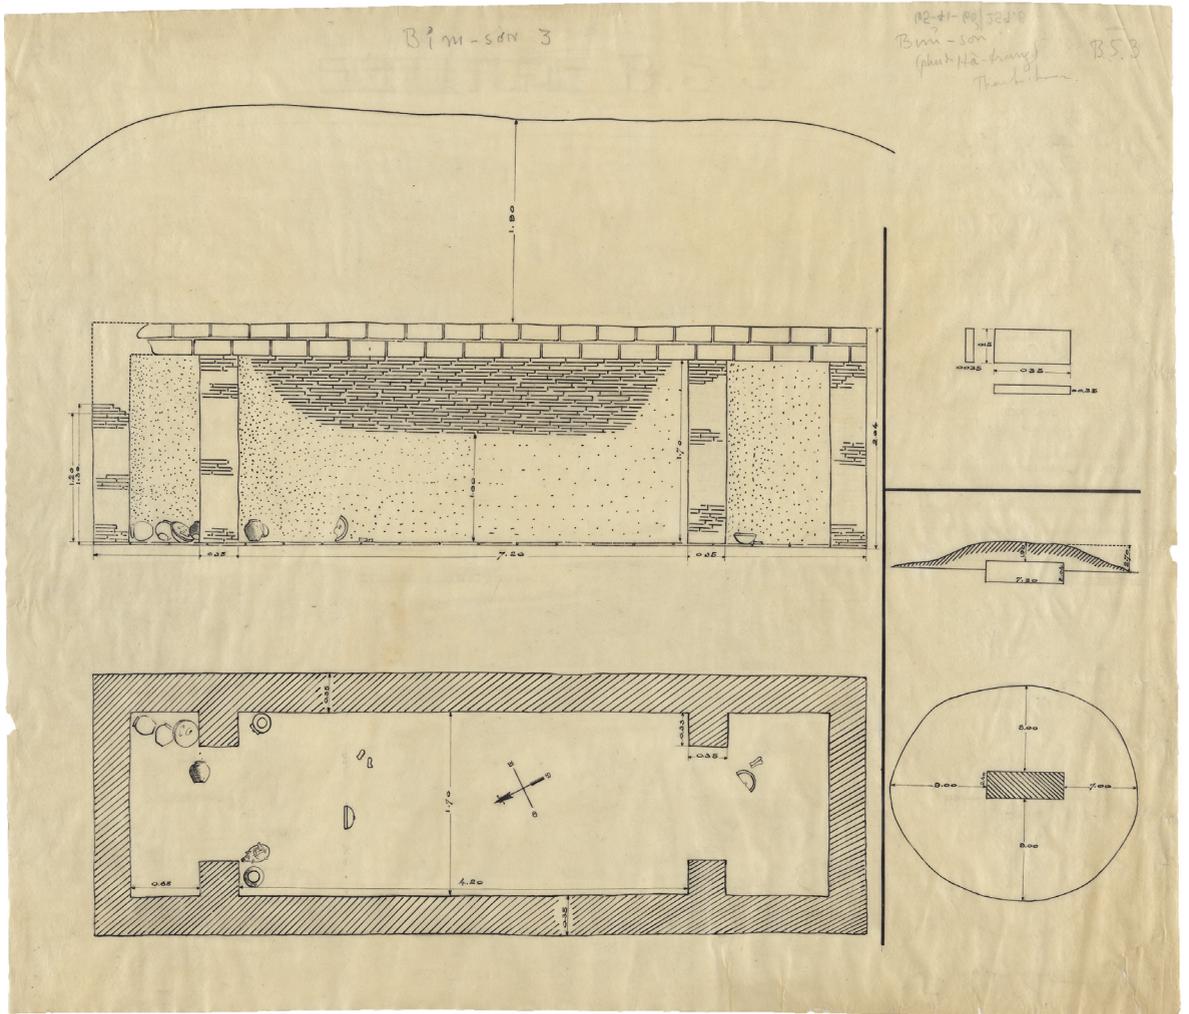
Cross-section and plan drawing of Bim Son 3, excavated in March 1939.
